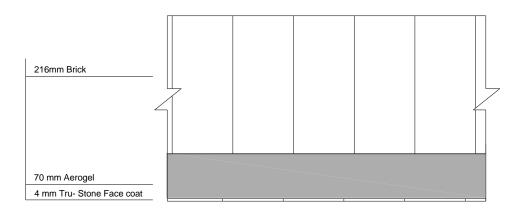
Solid wall layers with Tru-Stone face coating and Aerogel
